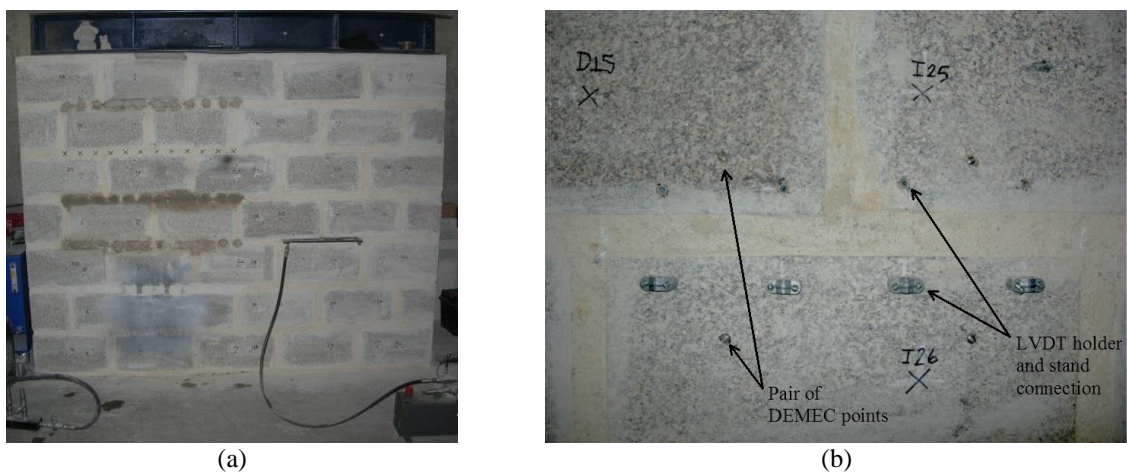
Single flat-jack test setup: (a) flat-jack test position in the regular masonry wall; and (b) attachment of LVDT holders and DEMEC points
